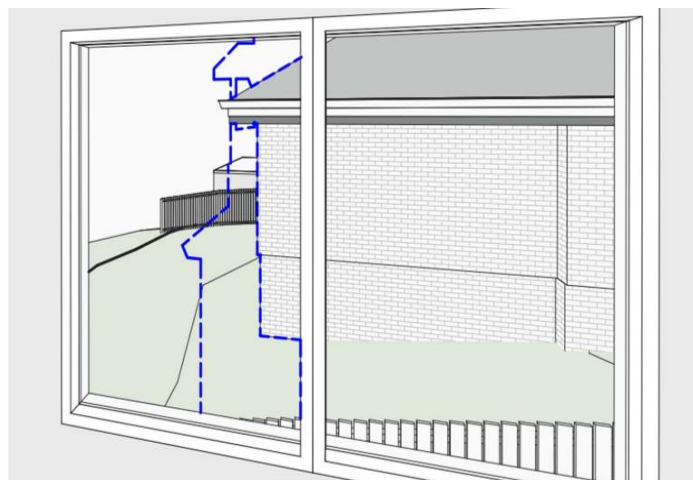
View through ground level window at 5 Ryries Parade towards proposed dwelling (existing dwelling edged in blue), Mona Building Designs
